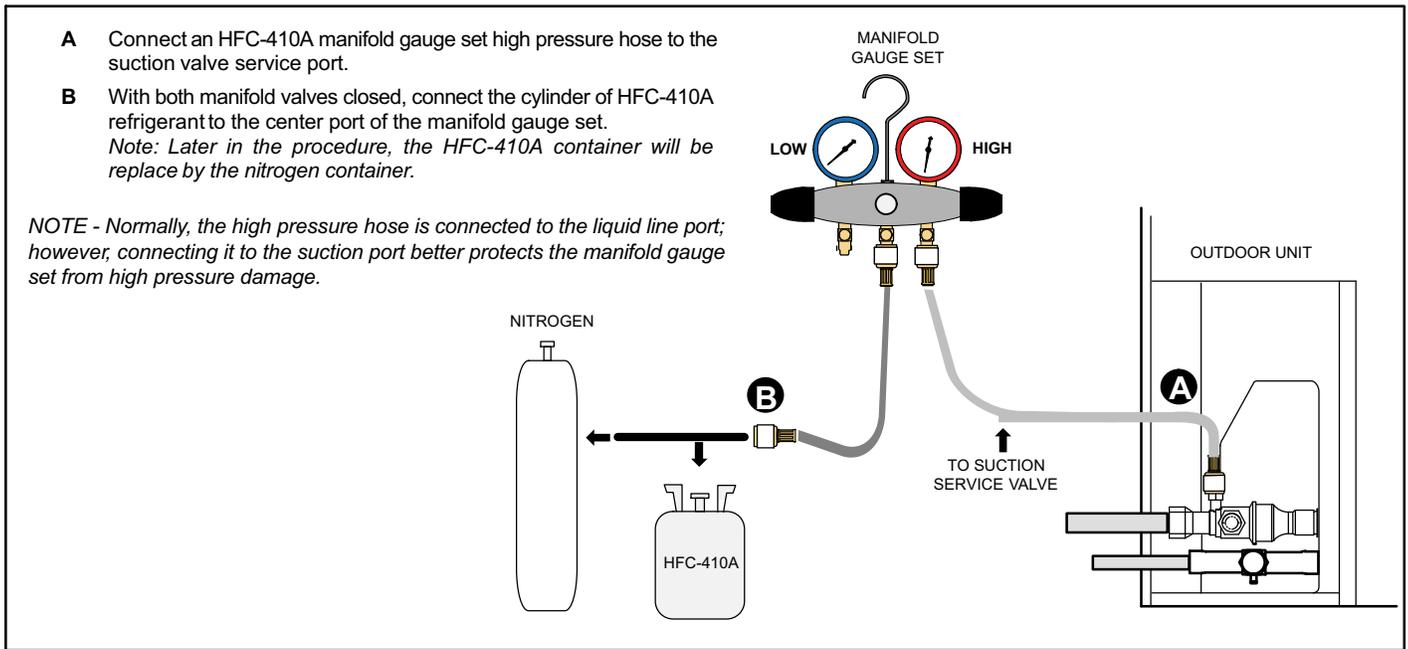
Typical Leak Testing Manifold Gauge Set Connections
